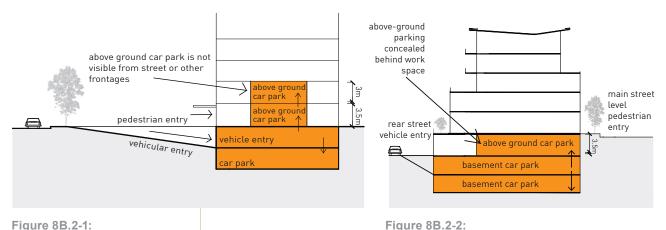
B.2-1: Multi-storey above ground car park is housed within the building to facilitate active street frontages.
